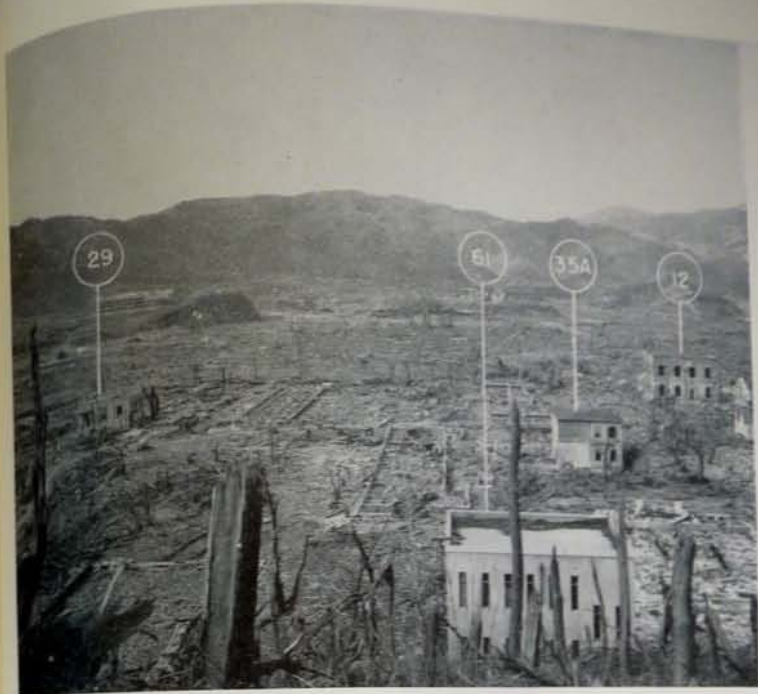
1,500 feet from GZ. Group 17, general view looking west across debris of burned buildings.
